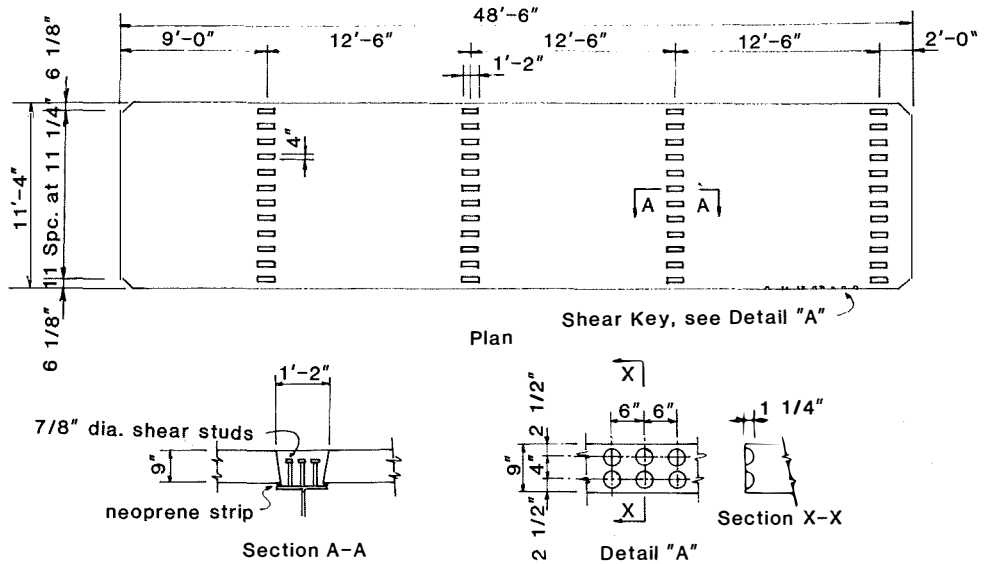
Sunshine Skyway Steel Alternate, details of precast roadway plank.
